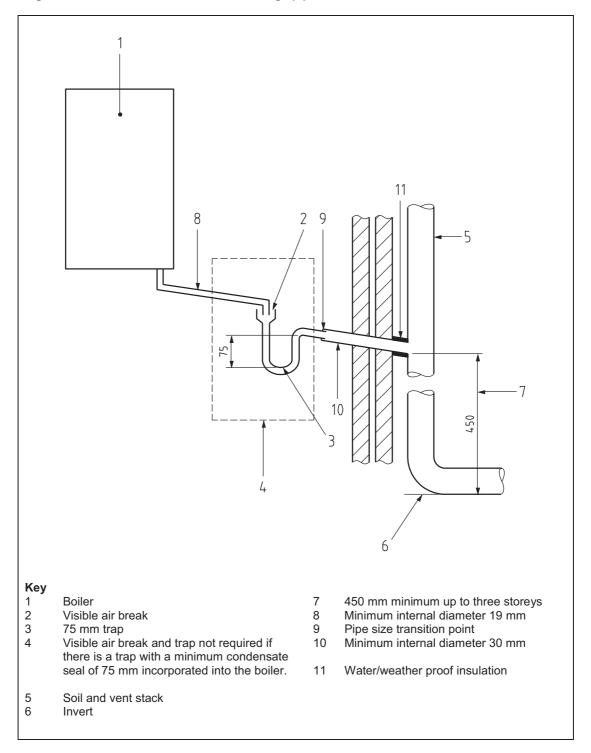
Connection of condensate drainage pipe to external soil and vent stack
